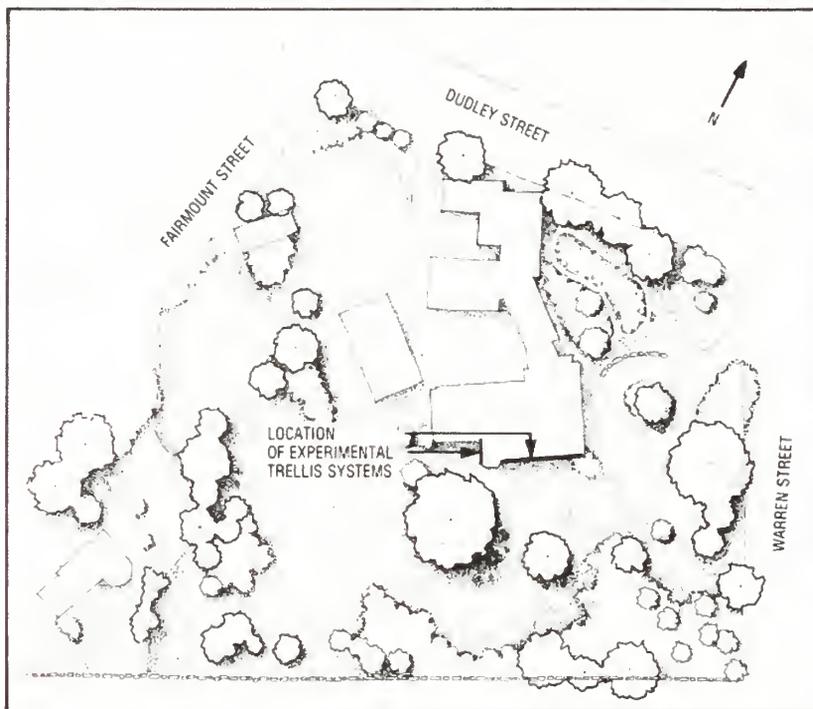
Site plan of Fairsted; the experimental trellis systems were installed on the south and west elevations. Drawing by Karen Day.
